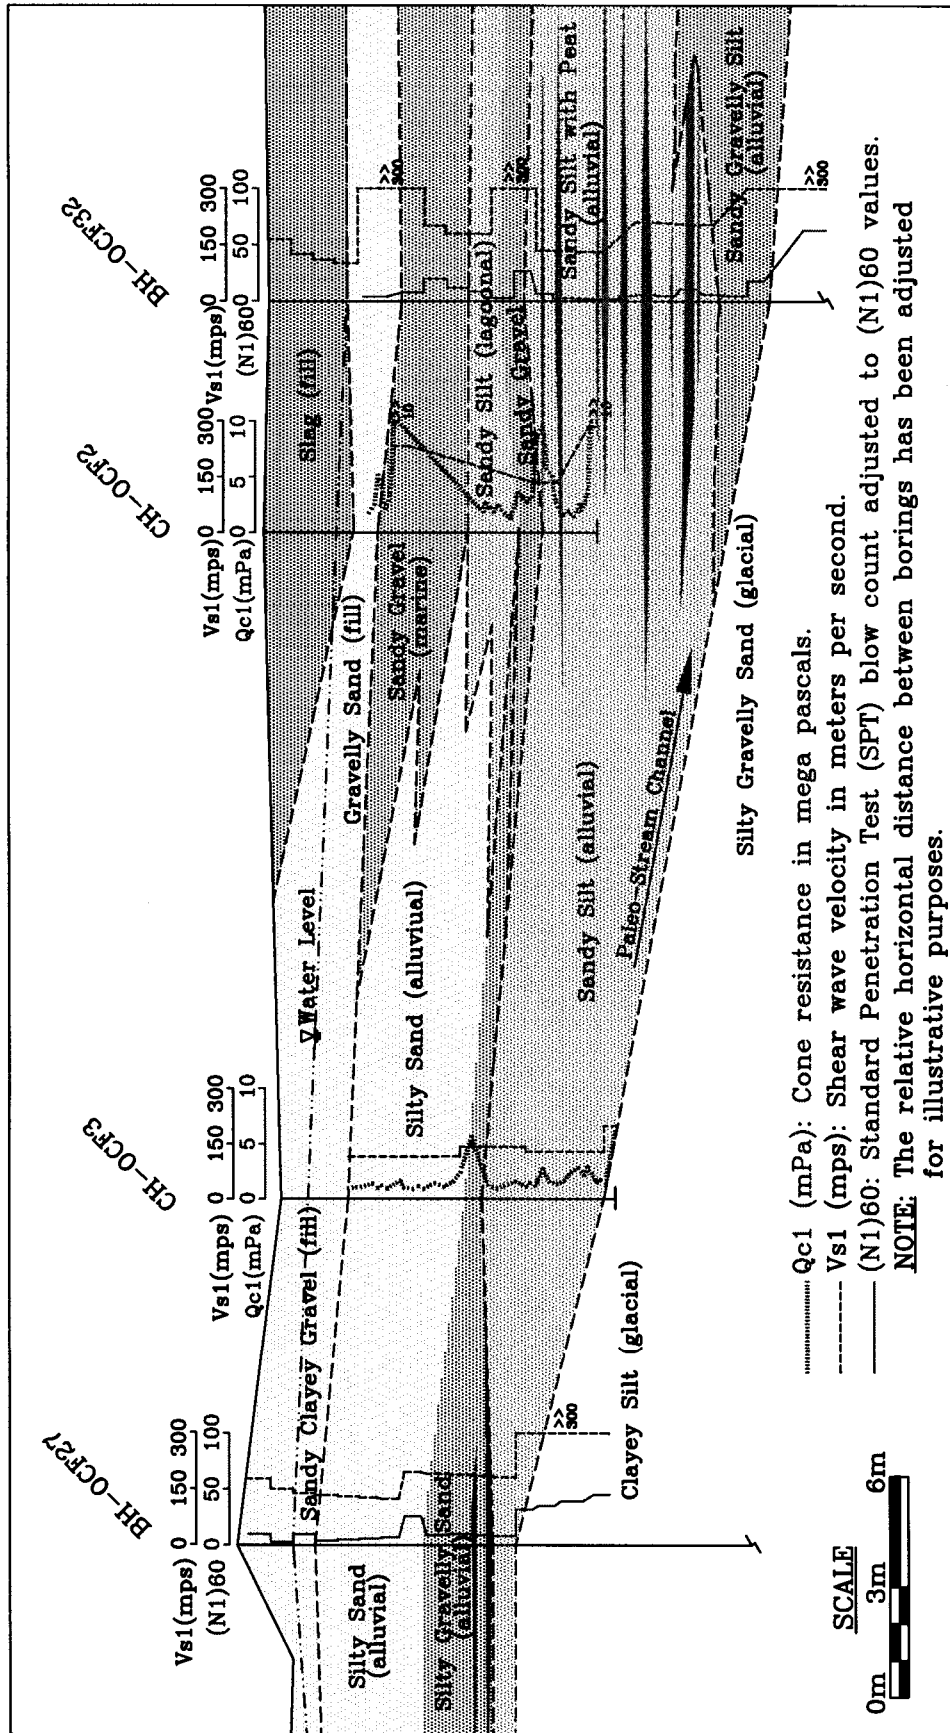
Longitudinal Cross Section of the Cooling Pond Drainage
